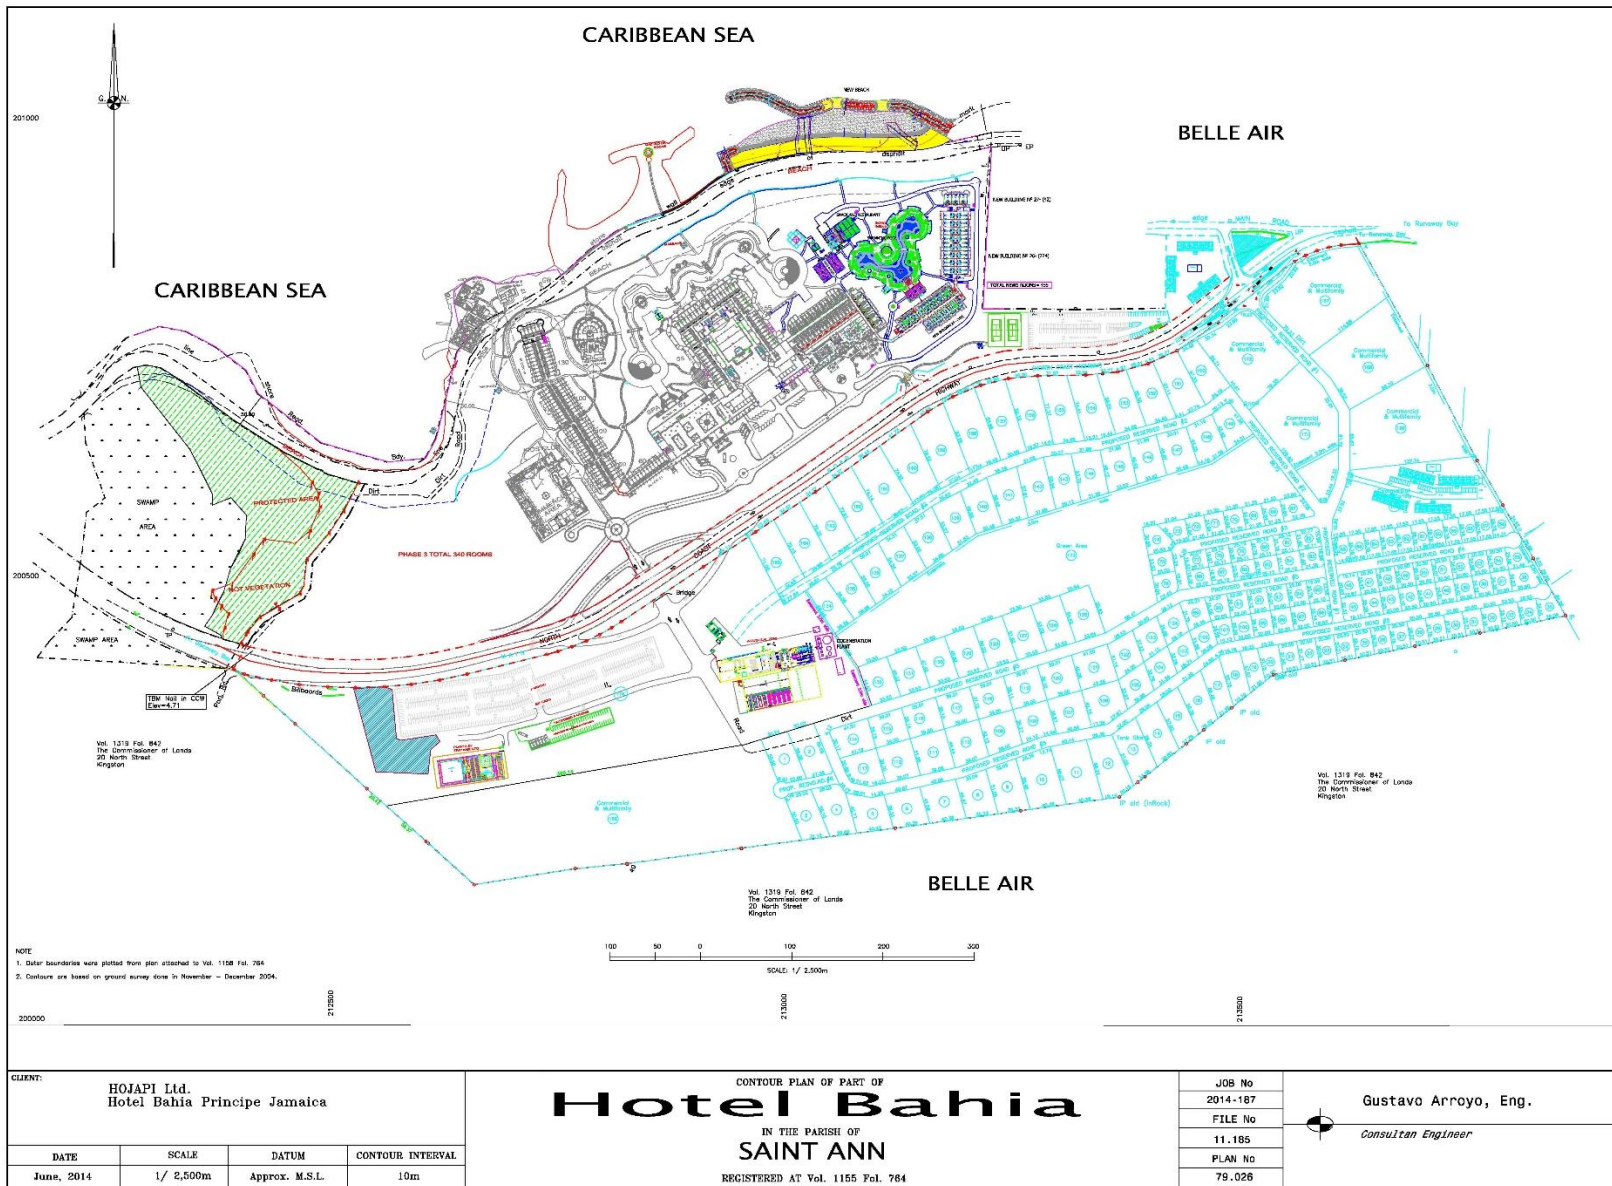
Master plan of the Gran Bahia Principe resort showing proposed additional rooms, proposed cogen plan and proposed lagoon beach.
